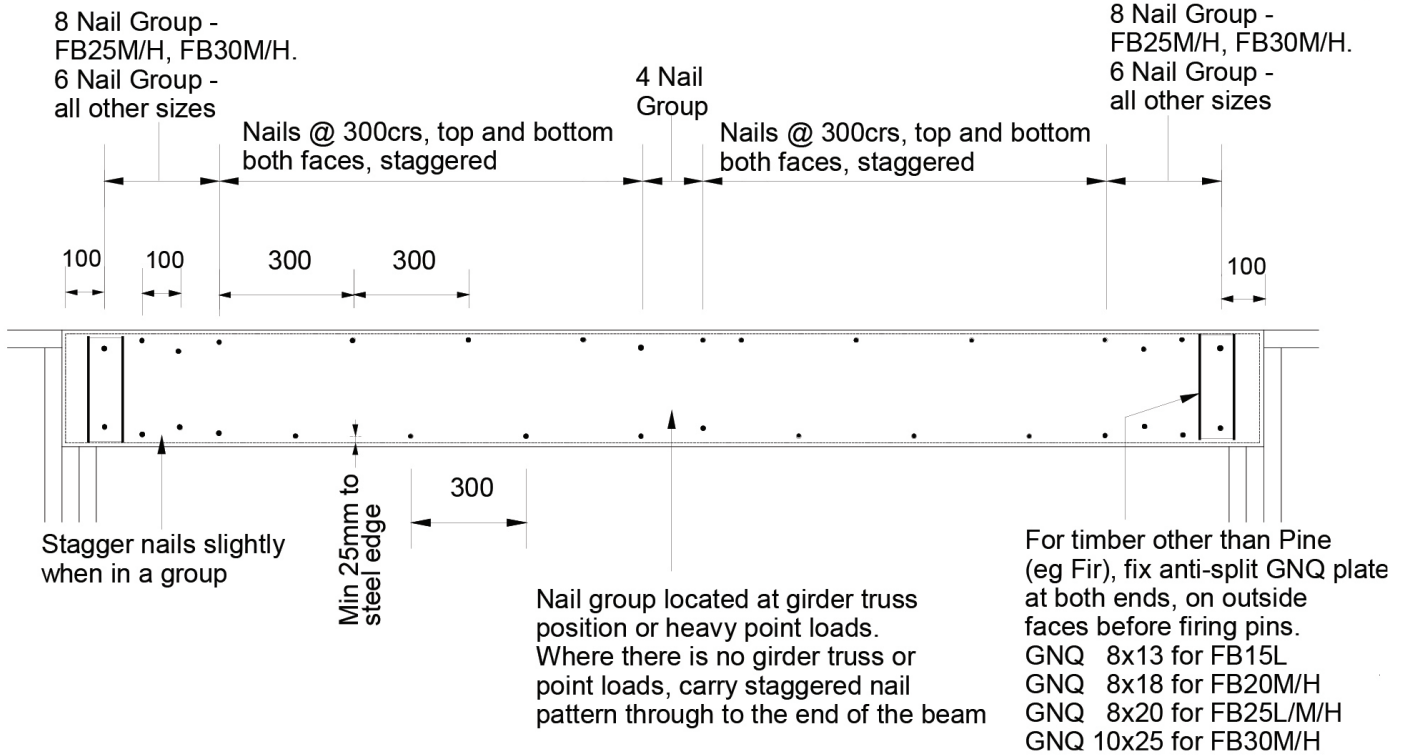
Typical Nailing Details for Simply Supported Beams (Both Faces)
